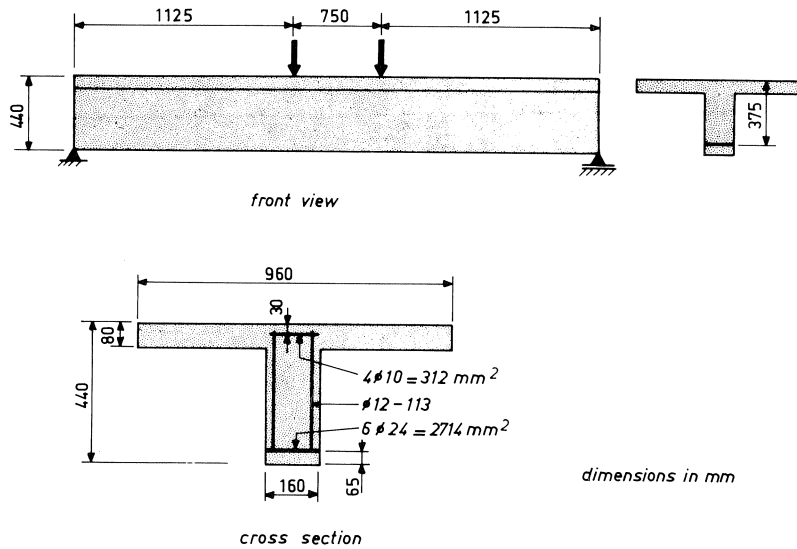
Survey of the structure; shear test on a T-beam.
